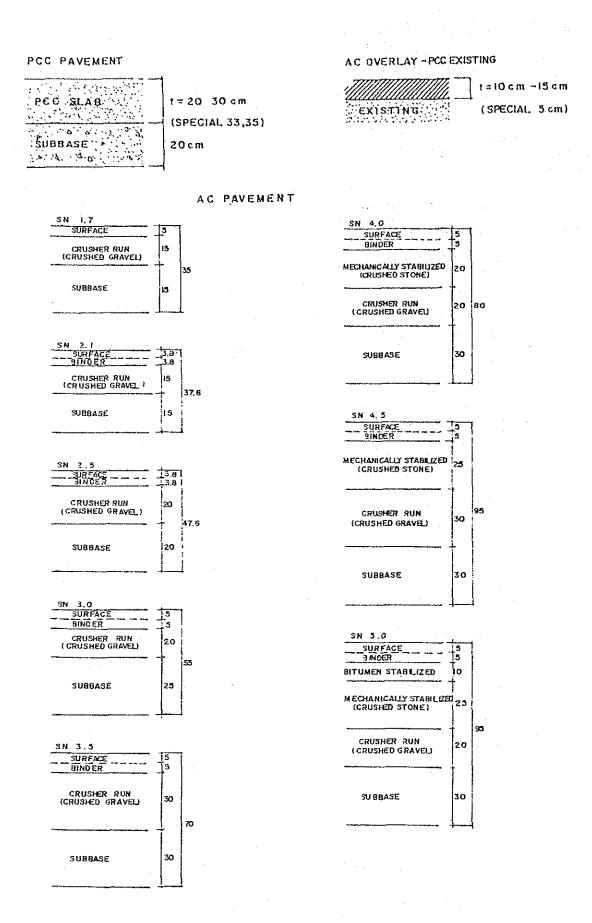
EXAMPLE OF CROSS SECTION DESIGN
